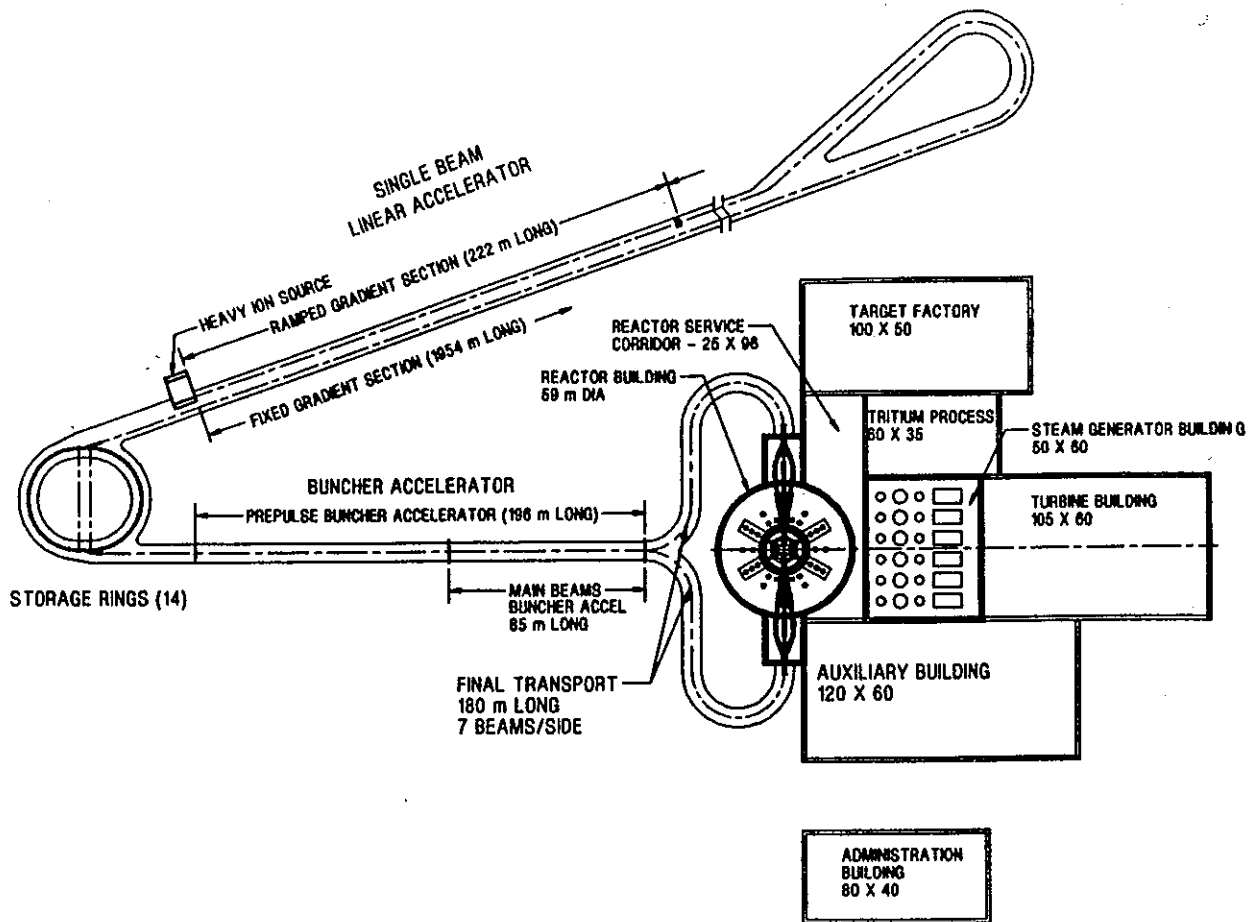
Heavy Ion Reactor Plant Site Plan
